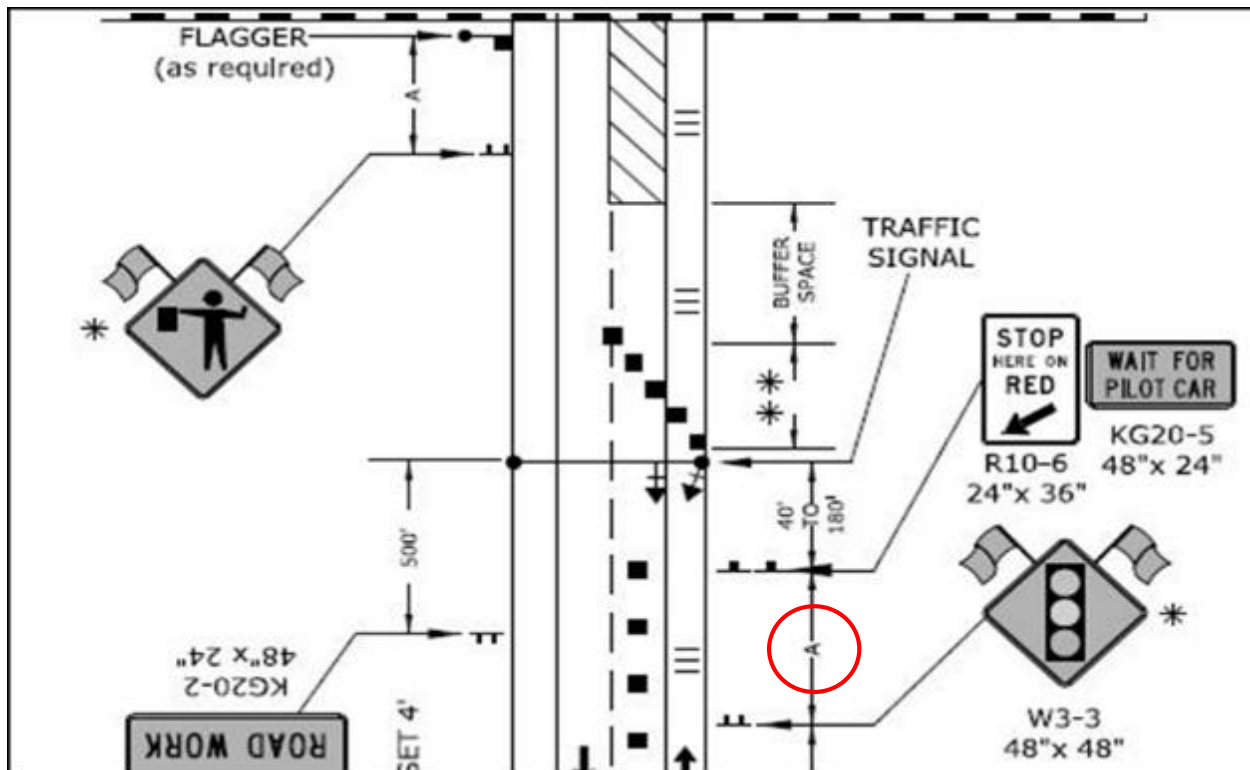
Snapshot of the temporary traffic control plan used for locating the traffic signs (Source: KDOT).
